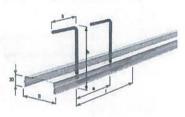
BINDAX rod connecting element for joining reinforced concrete elements 1. reinforcing rod. 2. profile (rail) made of galvanized sheet steel. 3. PVC tape
